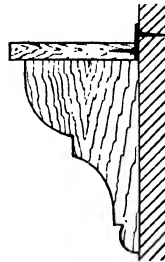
Side Elevation of Shelf Supported on Brackets
